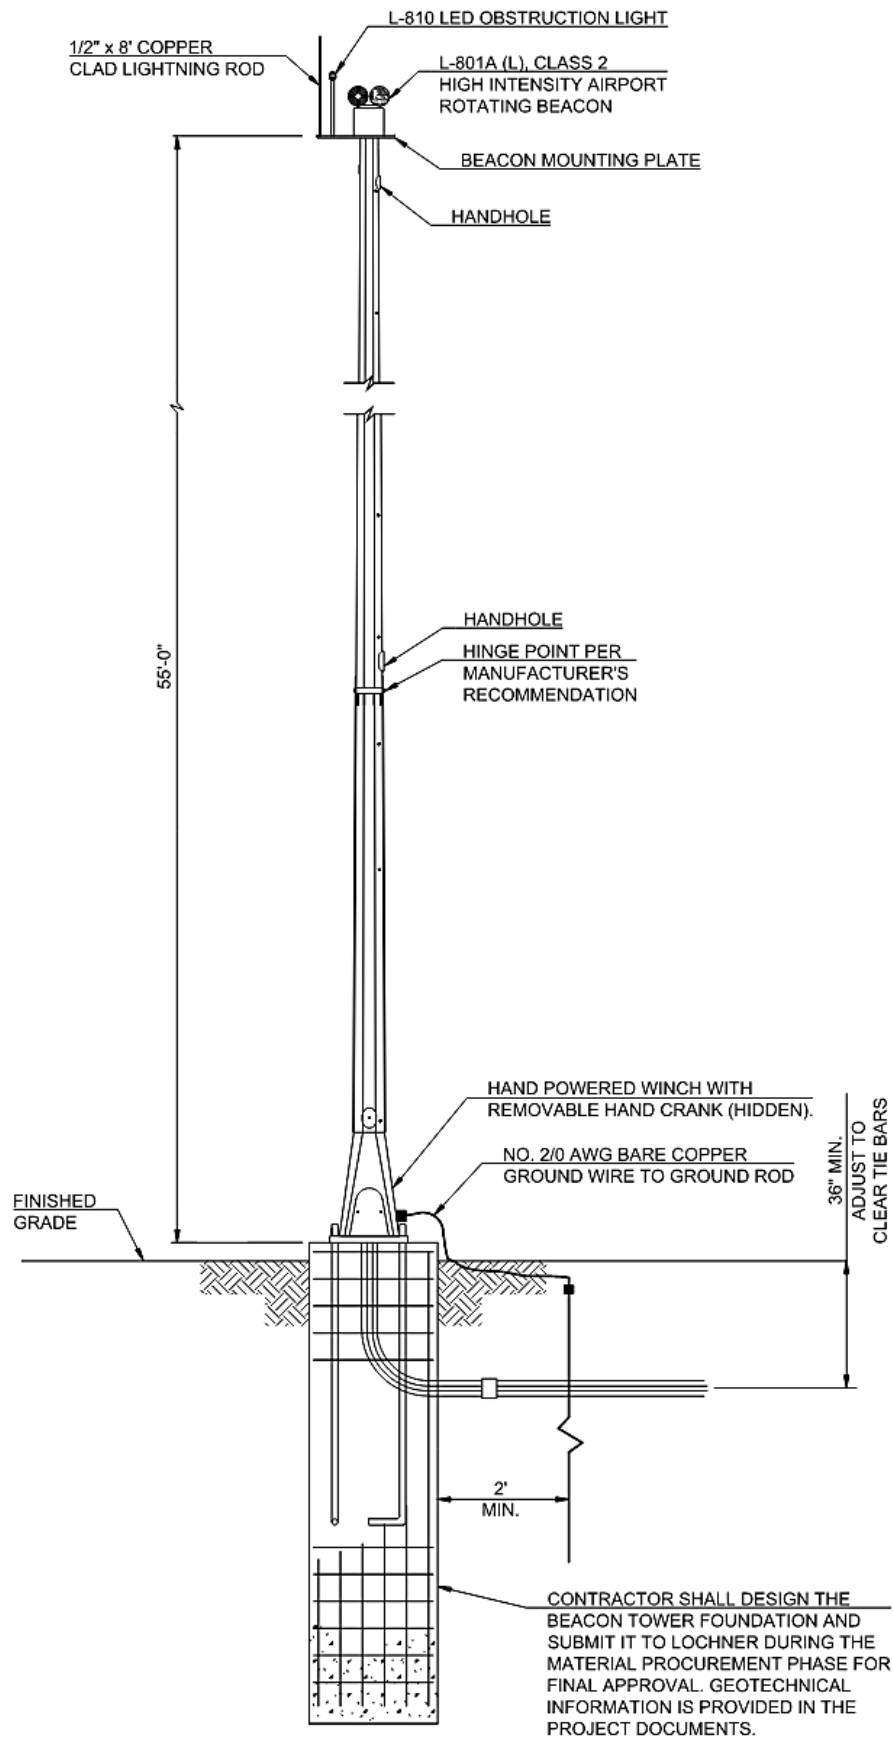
Proposed Beacon and Tip-Down Pole Tower
